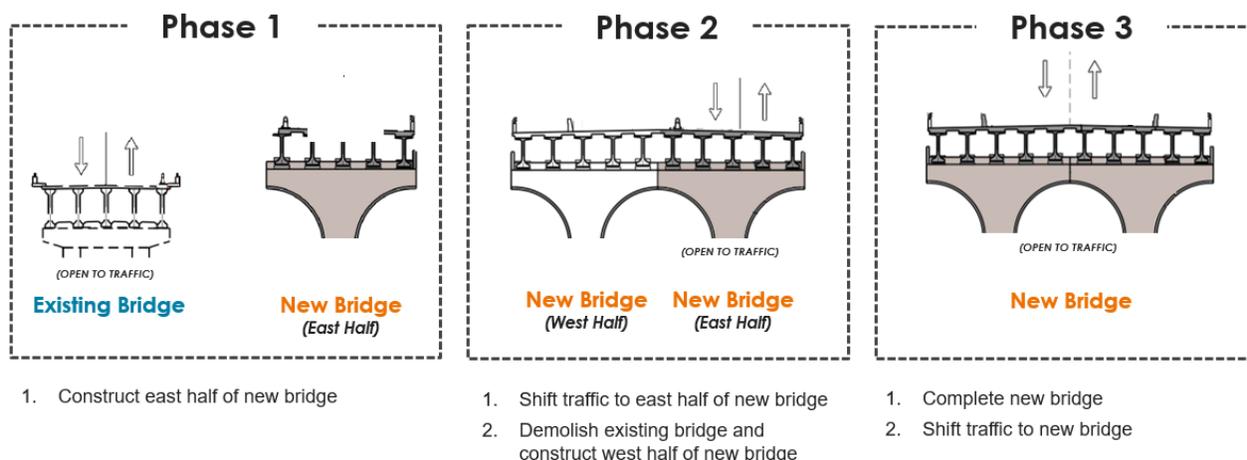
PREFERRED ALTERNATIVE BRIDGE CONSTRUCTION PHASING
